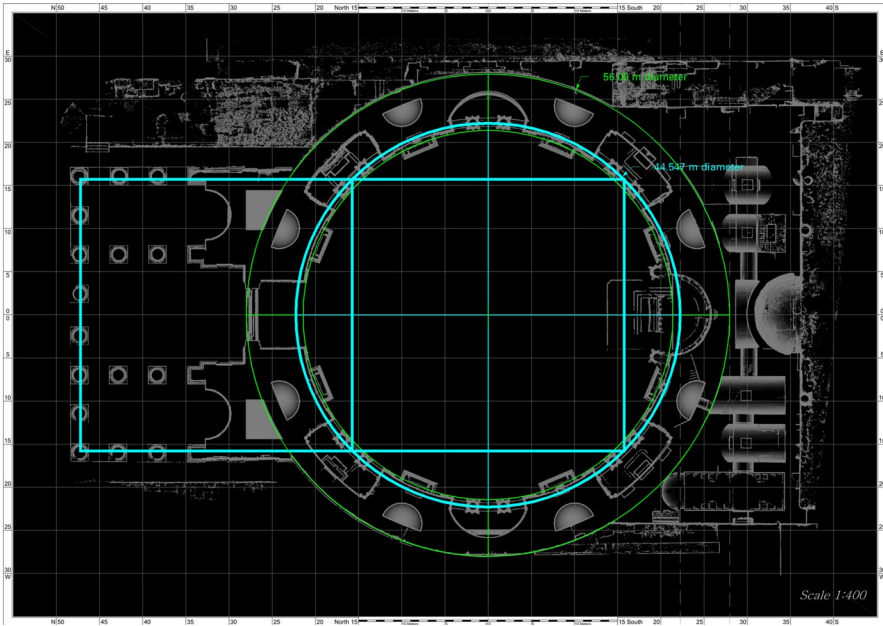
Bern Digital Pantheon, Pantheon, horizontal cross-section, cutting between the ground floor and the first cornice, BDPP0089, 2009, with overlay, after Mark Wilson Jones (in cyan)
